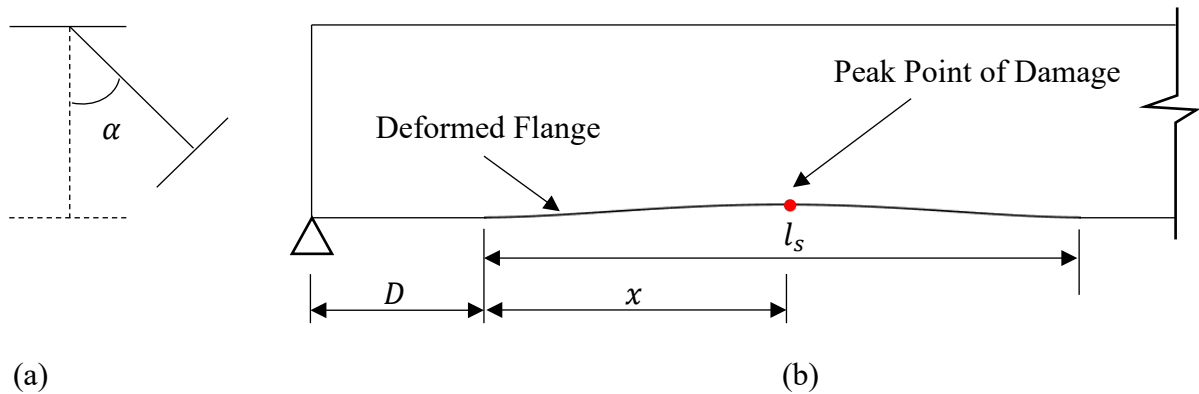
Category T damage profile in (a) cross-section and (b) elevation (reprinted from Wang & Thrall, 2019).
